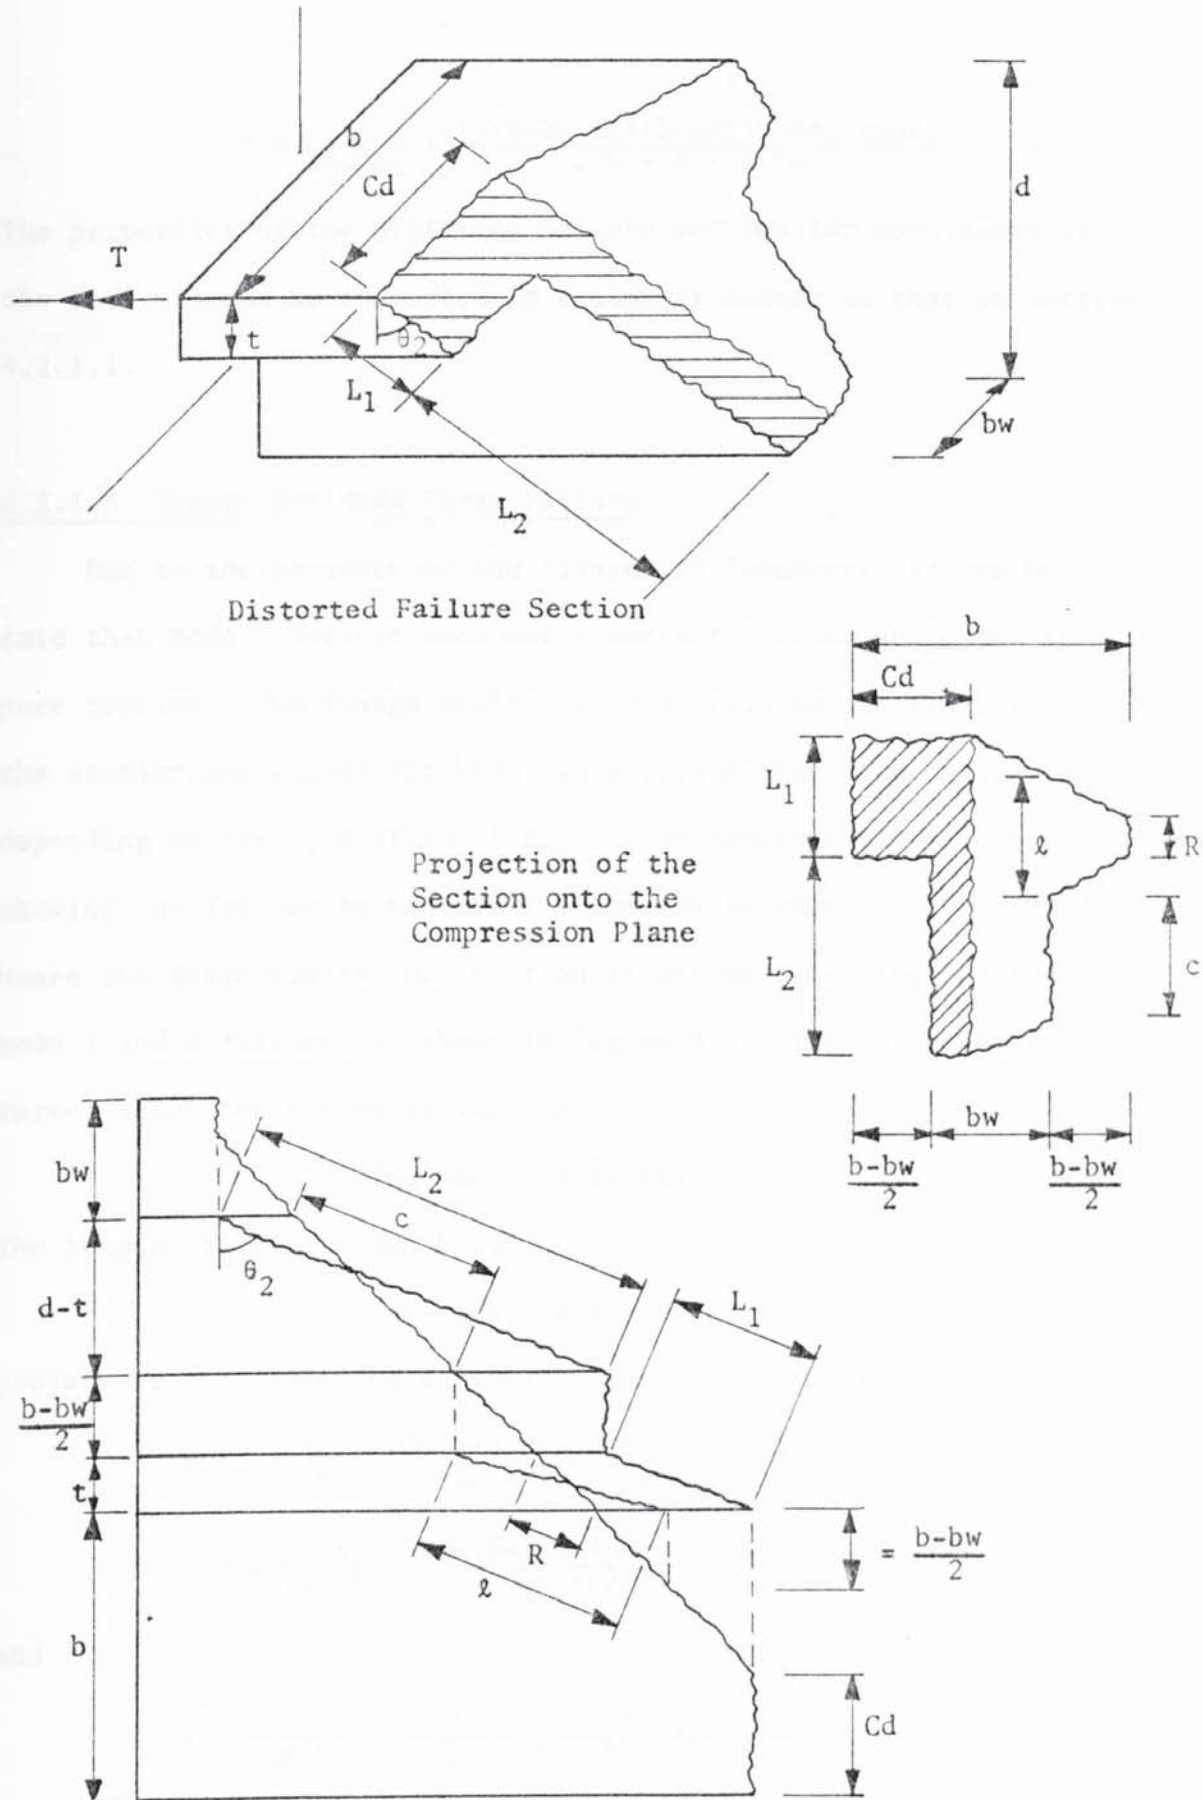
MODE TWO FAILURE IN PLAIN CONCRETE T-MEMBERS - II
